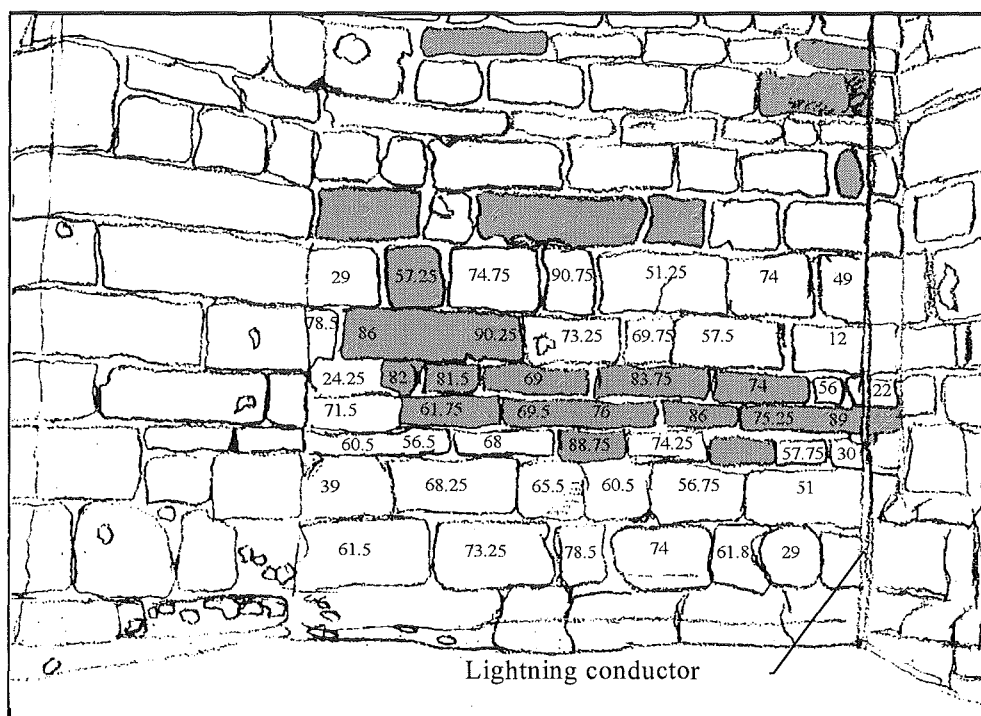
Sketch of Moretonhampstead Church, South wall. Shaded blocks are Type C granite. The first course above ground was excluded from the evaluation as it was not horizontal.
